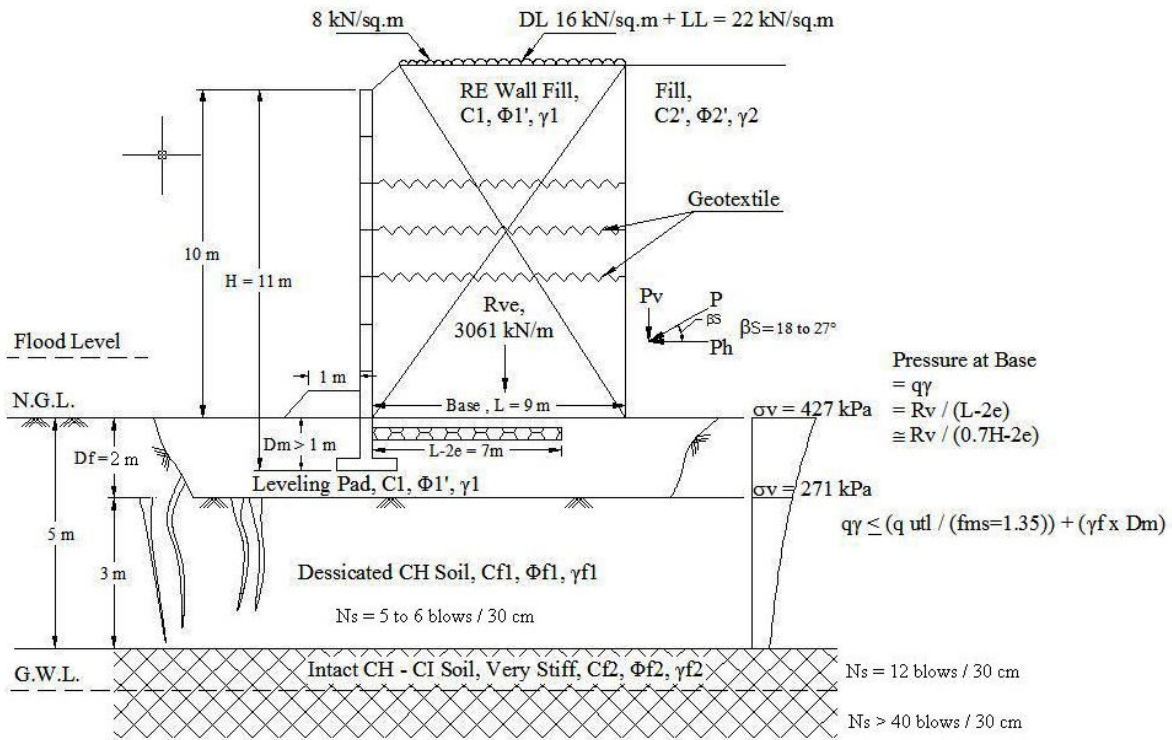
Sketch of typical segmental RE wall with notations, foundation soil, fill and stresses.
